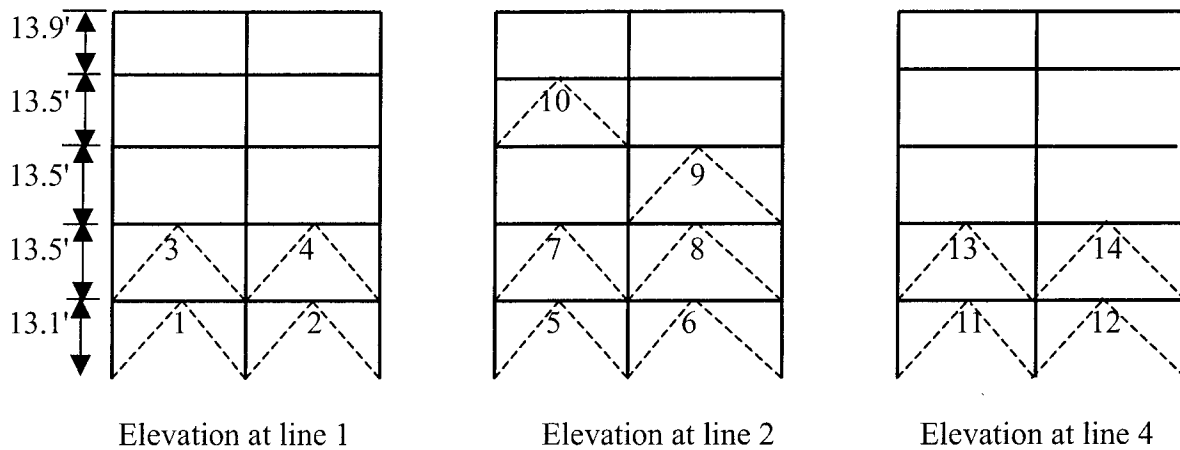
Elevation of the building in the north-south direction and possible damper locations
